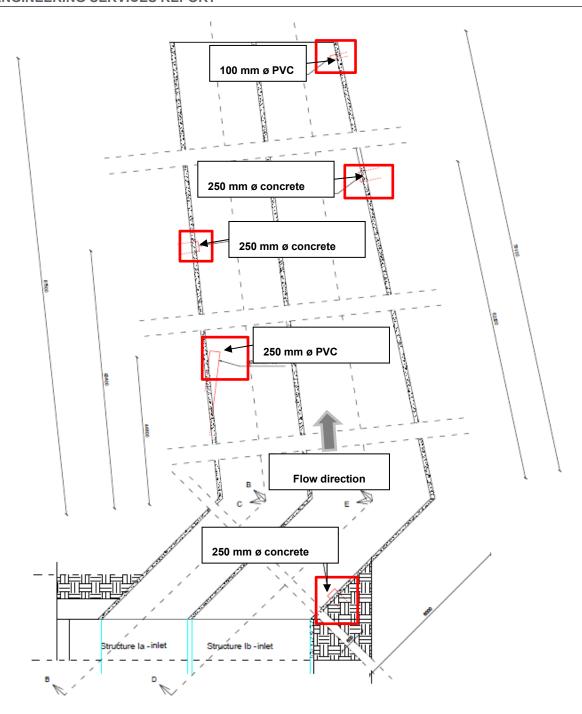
Stormwater Outfalls in the Twin Culvert Plan at Rathfarnham Ford
